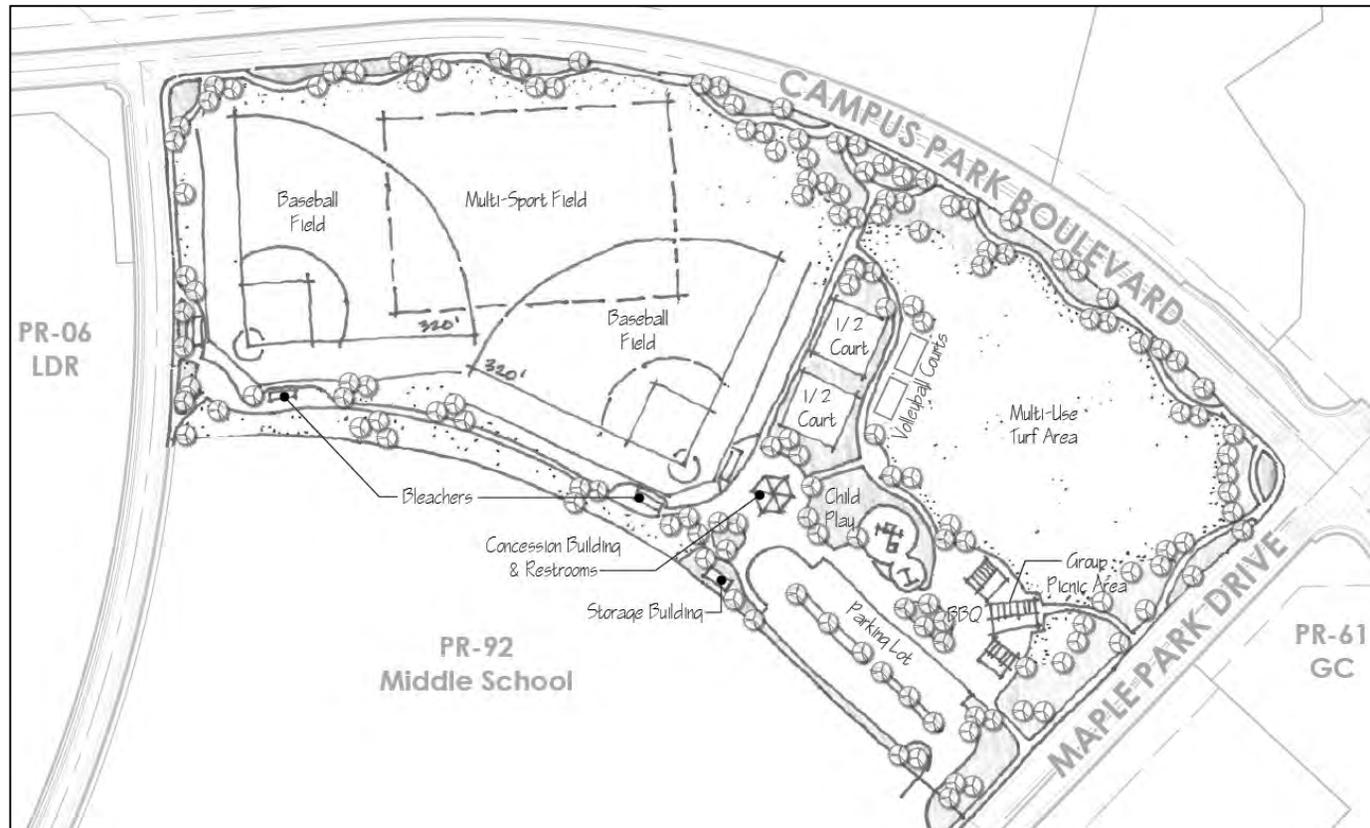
CONCEPT PLAN FOR PARK SITE PR-102
